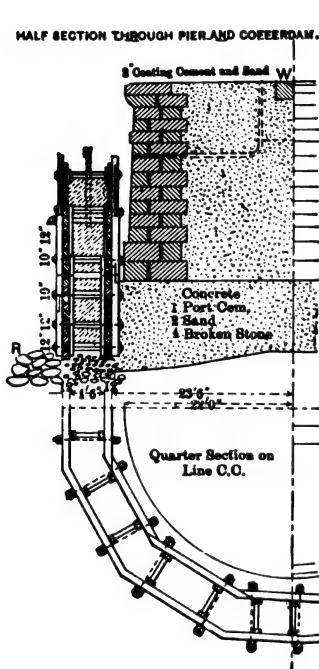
POLYGONAL COFFER-DAM, HARLEM SHIP-CANAL DRAWBRIDGE.
